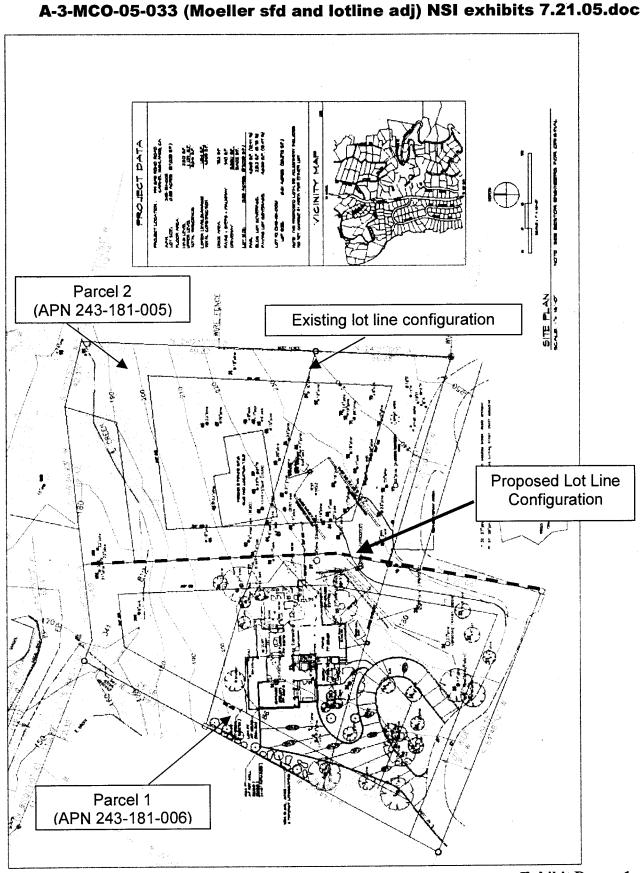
of 2 Proposed Lot Line Adjustment and Site Plan/Elevations for Proposed Development
